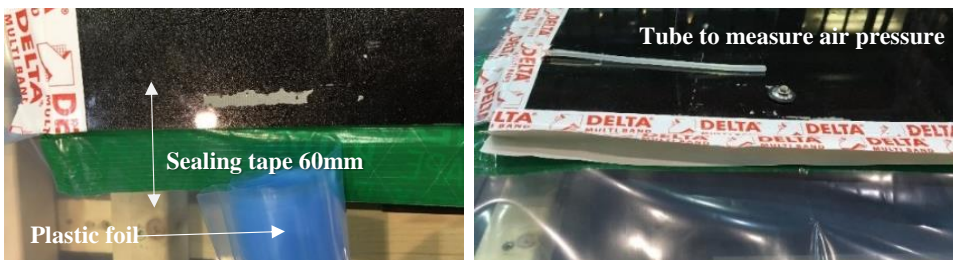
Sealing the edges of the BIPV system using sealing tapes and polyethylene foil (view from the frontside). On the right photo a tube used to measure the differential air pressure is visible lying on the black module [116].
